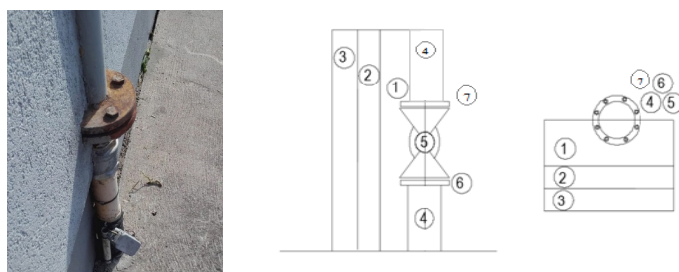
Gas pipeline inlet shut-off device after building insulation works [2]: 1 – Insulation material; 2 – Air gap; 3 – Exterior foundation wall of the building; 4 – Gas pipeline; 5 – Gas line shut-off device; 6 – Gas line threaded connection with shut-off device; 7 – Gas line flange type detachable connection behind the shut-off device.
